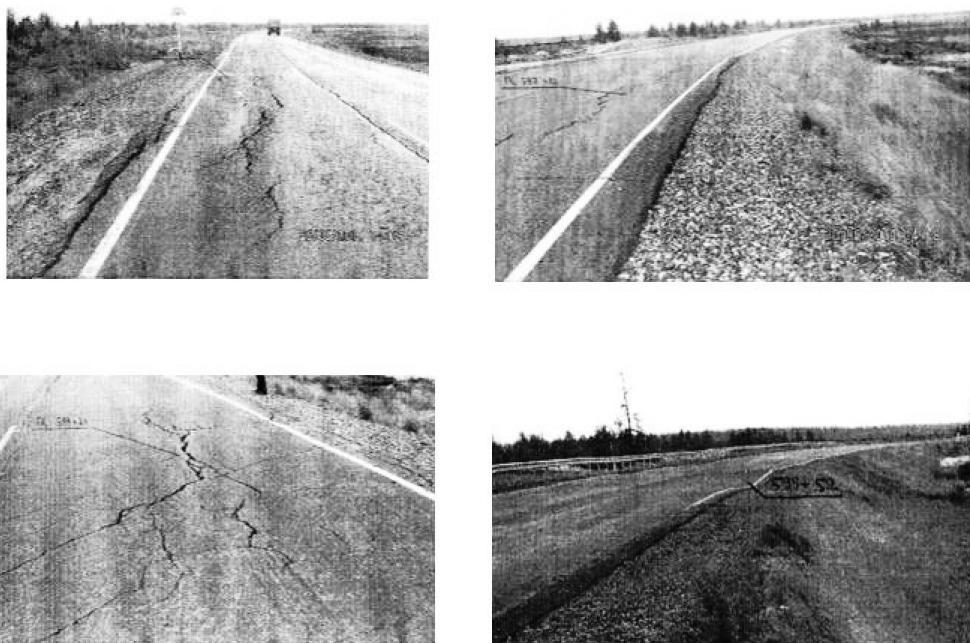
Defects of the road pavement and the roadbed.
